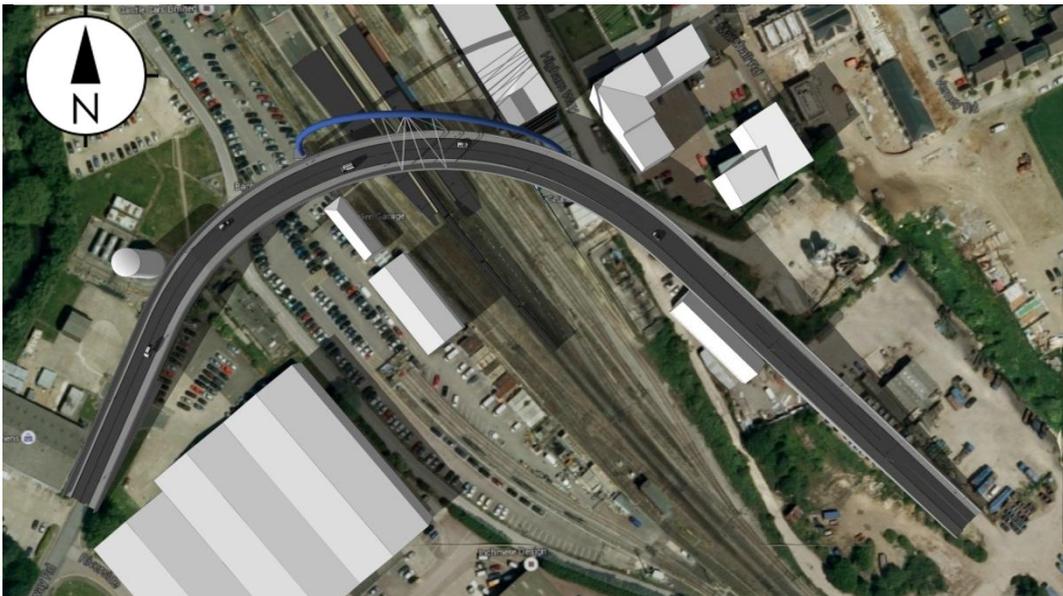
Cable stayed bridge deck bird's eye view – indicative alignment.
